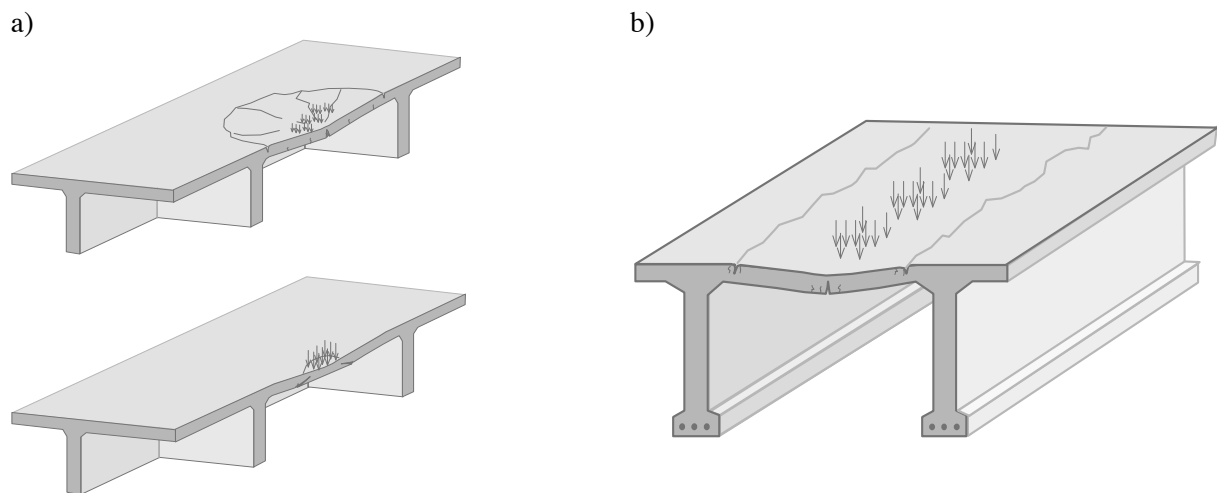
Examples of structures with thin UHPFRC slabs and slab failure modes: a) two-way ribbed slab with flexural and punching shear failure of thin slab; b) π -shaped girder and transversal flexural failure of thin slab.
